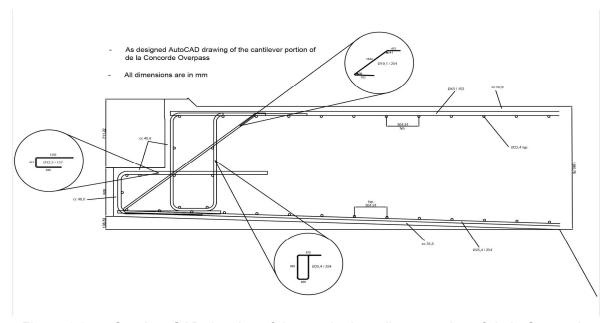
Our AutoCAD drawing of the cracked cantilever portion of de la Concorde Overpass (as designed)
